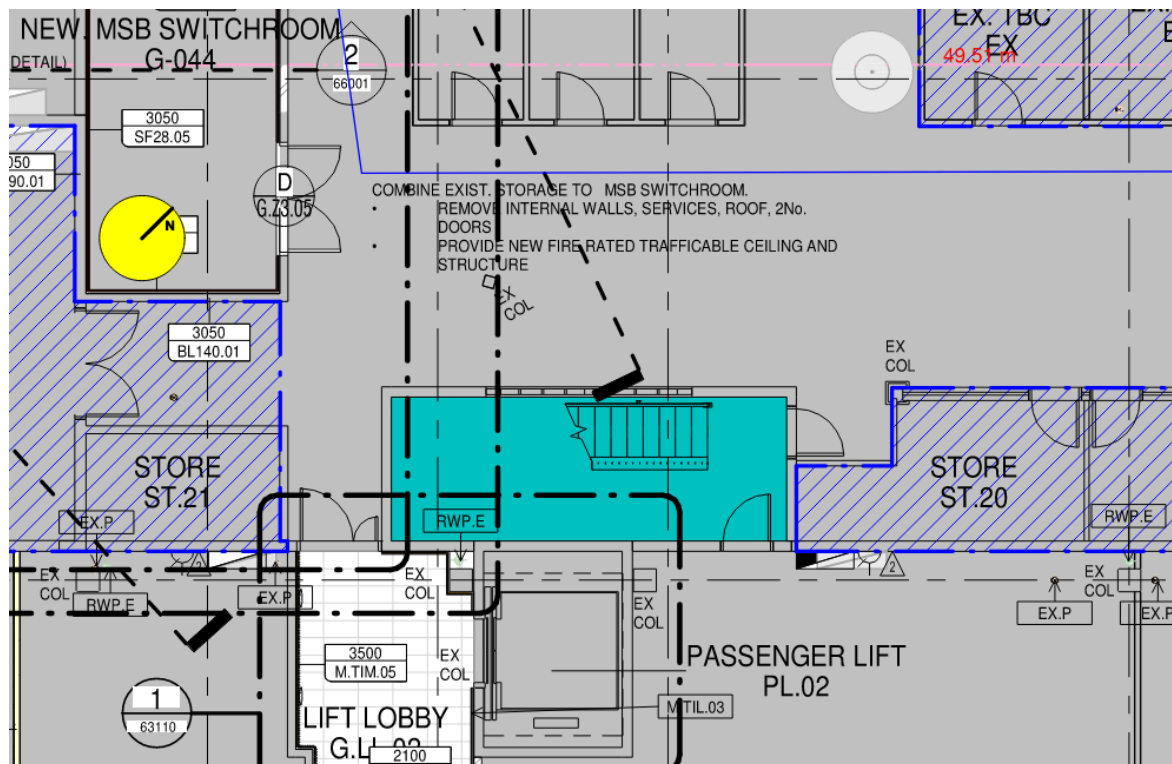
Existing stair north of passenger lift PL.02 – Ground Floor
